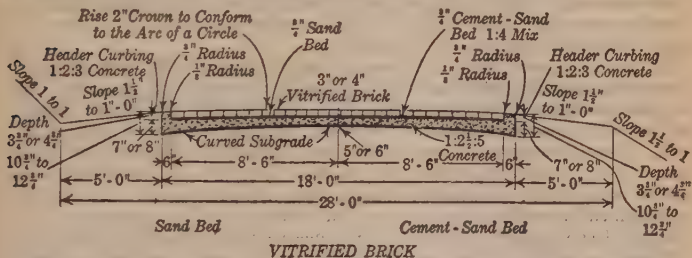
Pennsylvania Highway Department Standard Brick Pavement
